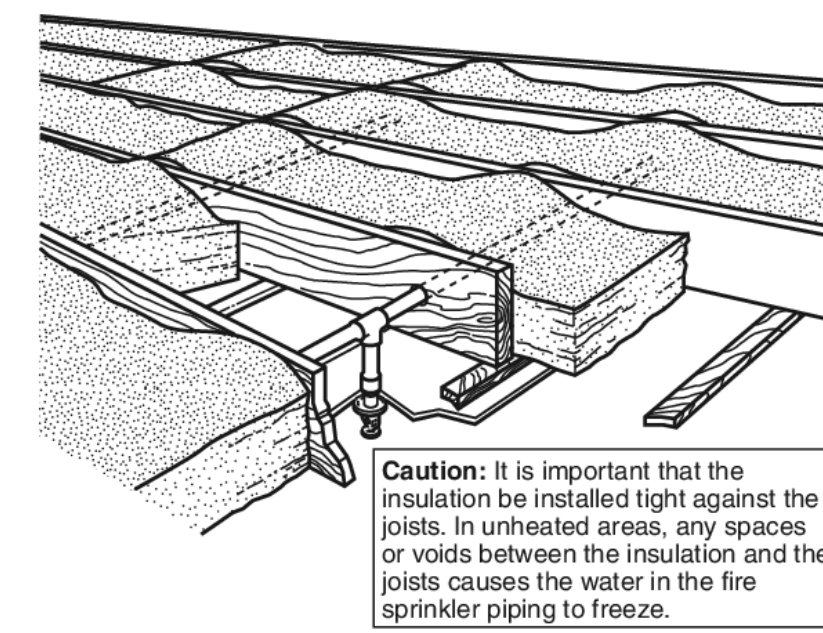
(a) Insulation Recommendations - Arrangement 1.
